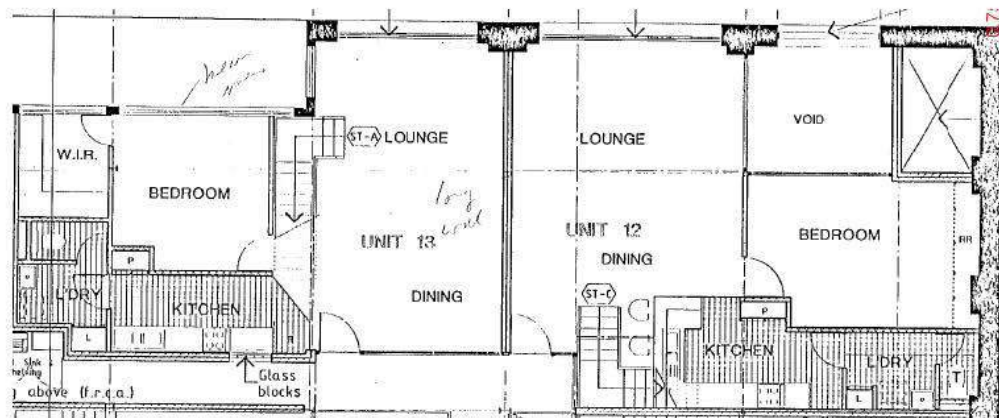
Second floor - Unit 13 has a bedroom window and loft largely unaffected by this proposal. Unit 12 has loft windows above.
